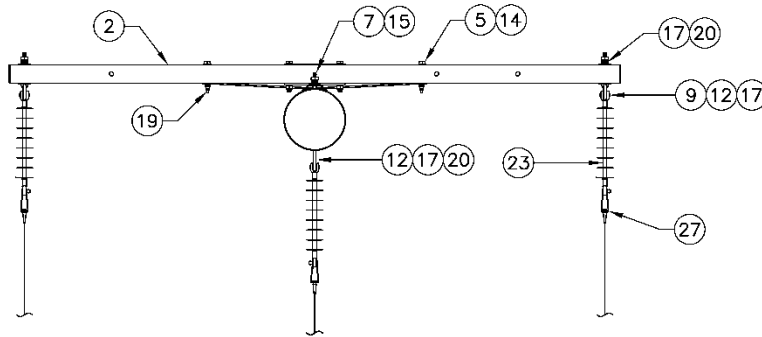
Three-Phase #4 AWG Copper Single Deadend Pole Top Assembly, Side View
